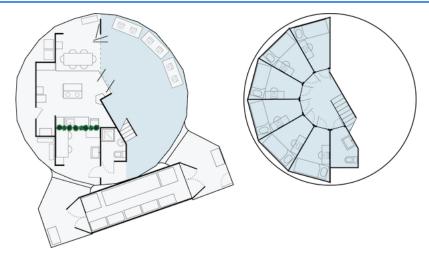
HI-SEAS Planimetry - Ground and first floor [27].
